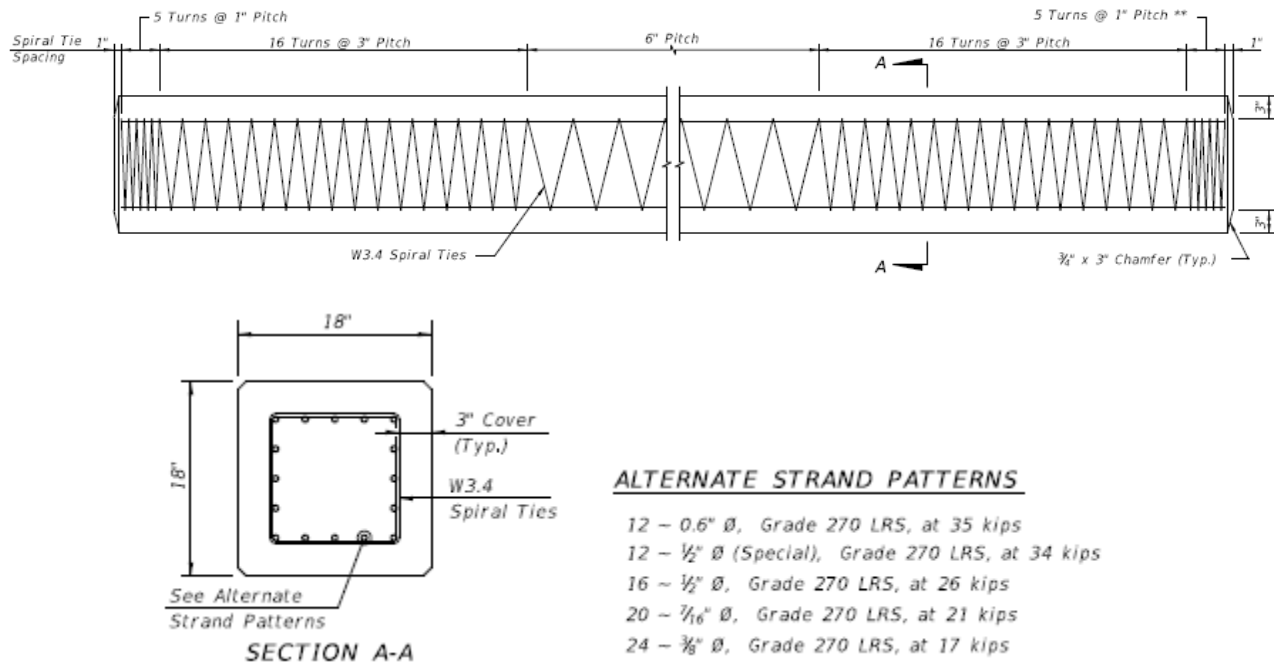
FDOT standard prestressed-precast concrete pile (FDOT Standard Drawings Index Series 455, 2018)
